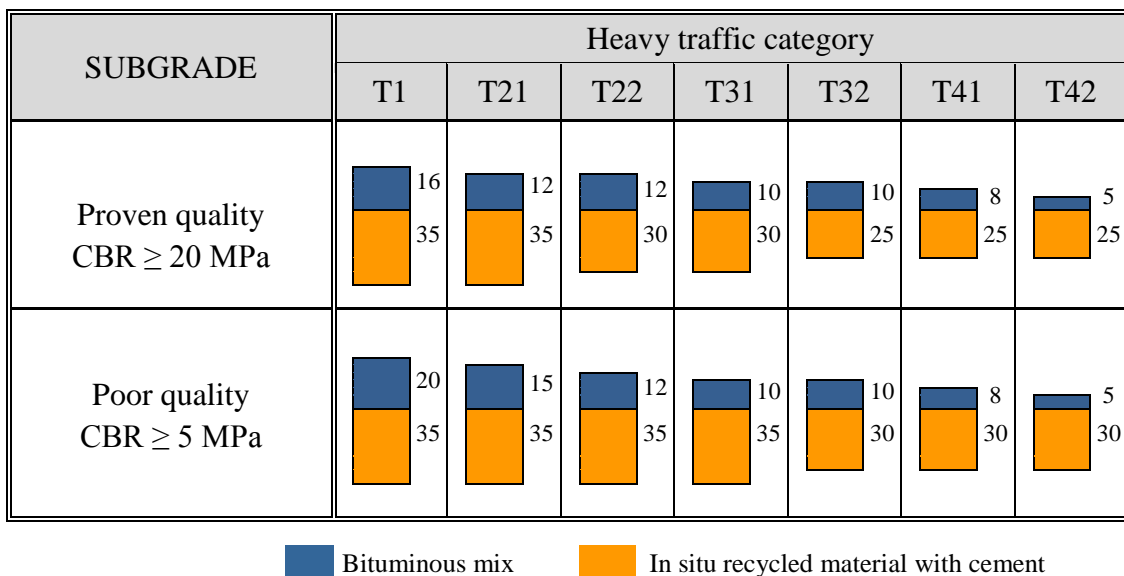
Catalogue of in situ recycled pavement with cement structural sections
